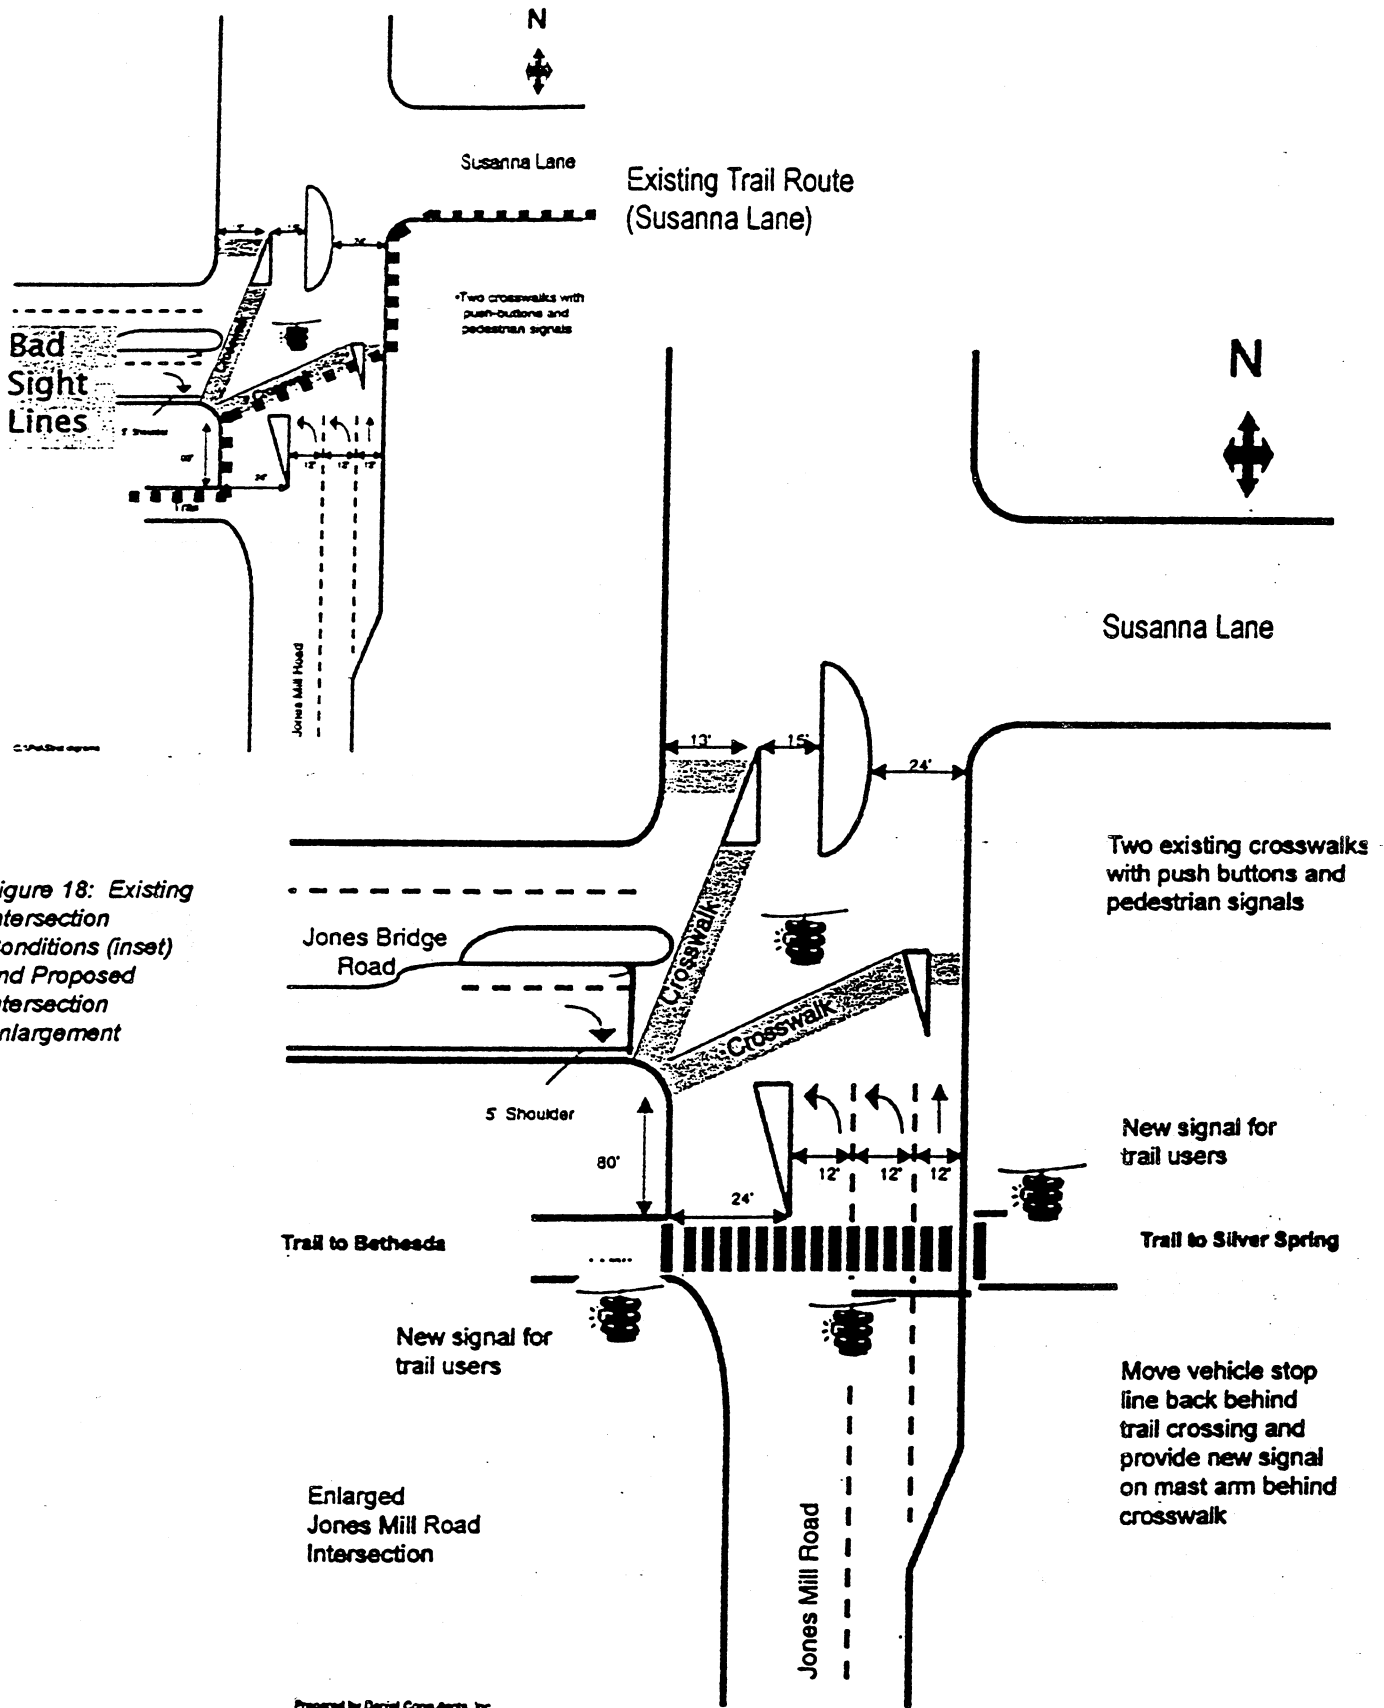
Existing Intersection Conditions (inset) and Proposed Intersection Enlargement
